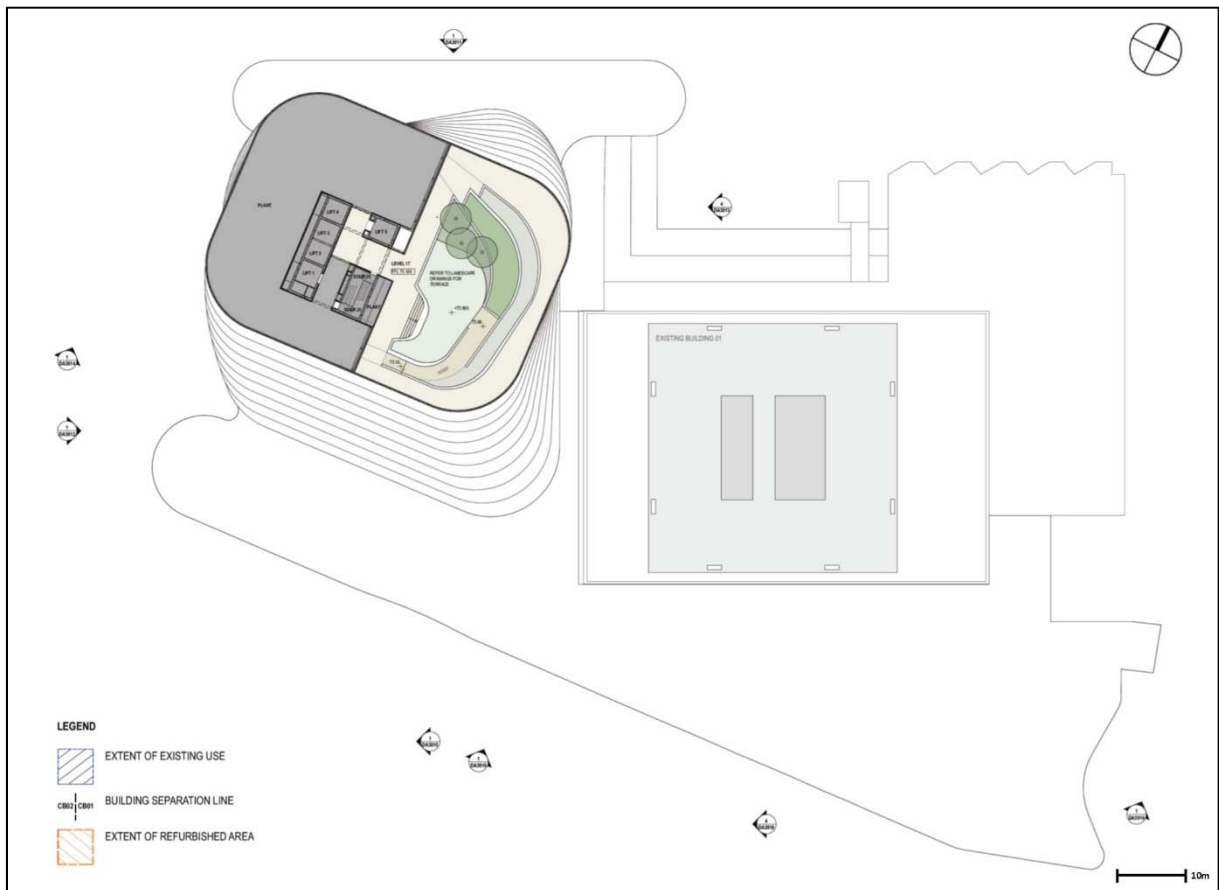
Level 7 Floor Plan (uppermost podium level)
